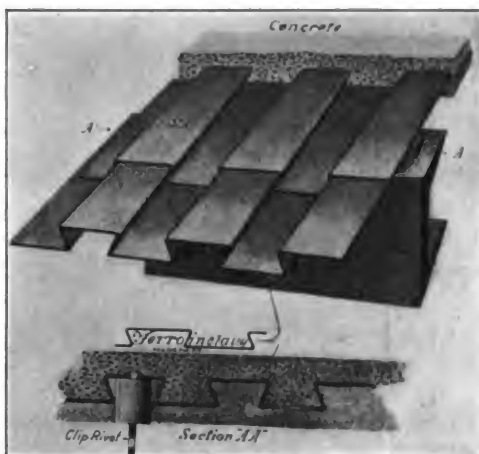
DETAILS FOR ROOFING—Ferroinclave is laid in much the same manner as ordinary corrugated iron roofing. The purlins—l beams, channels or Z bars—may be spaced any distance up to 9 feet 9 inches. The standard size Ferroinclave sheets are 10 feet long, and purlins should be so spaced that the lap (usually 3 inches, or more) of the two sheets comes on one of them. A spacing of 4 feet $10\frac{1}{2}$ inches is most economical, as it allows the use of sheets 10 feet long and requires a minimum of concrete and erecting labor.
